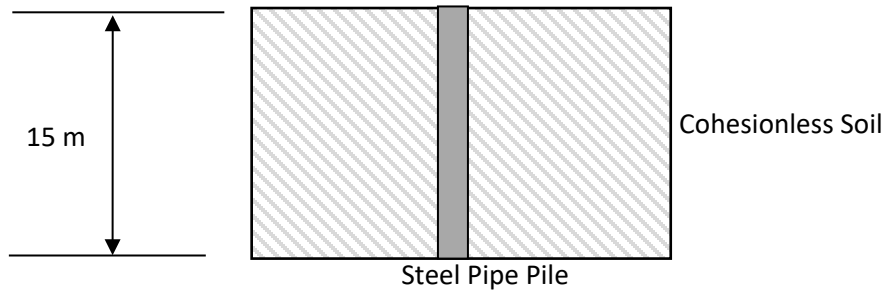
15 m embedded steel pipe pile in cohesionless soil
